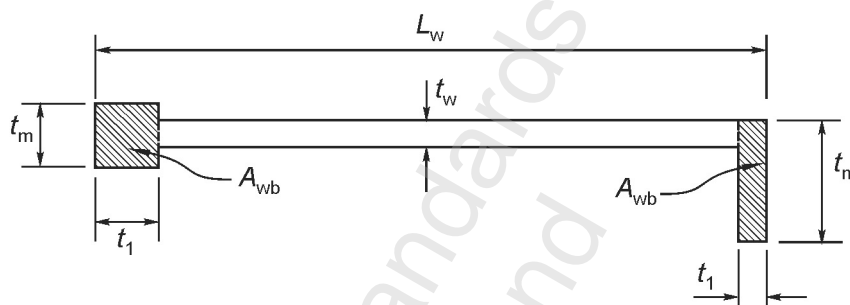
Minimum dimensions of boundary elements of wall sections in plastic hinge regions
